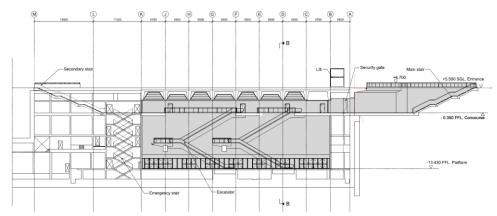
Ny Ellebjerg, deep underground station, Typical Cross section
